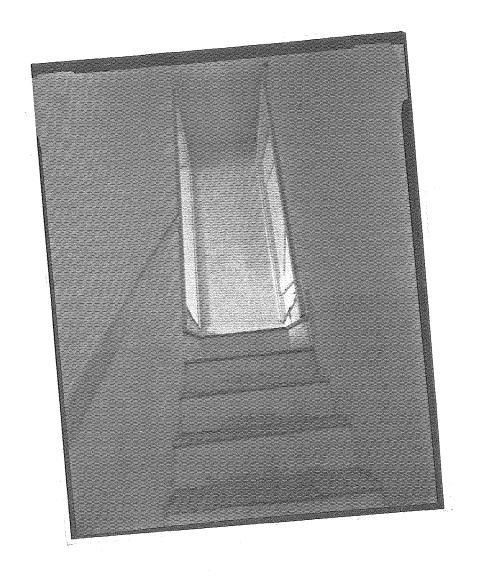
111-113 Ice Street, first floor: detail of the north staircase looking south.
